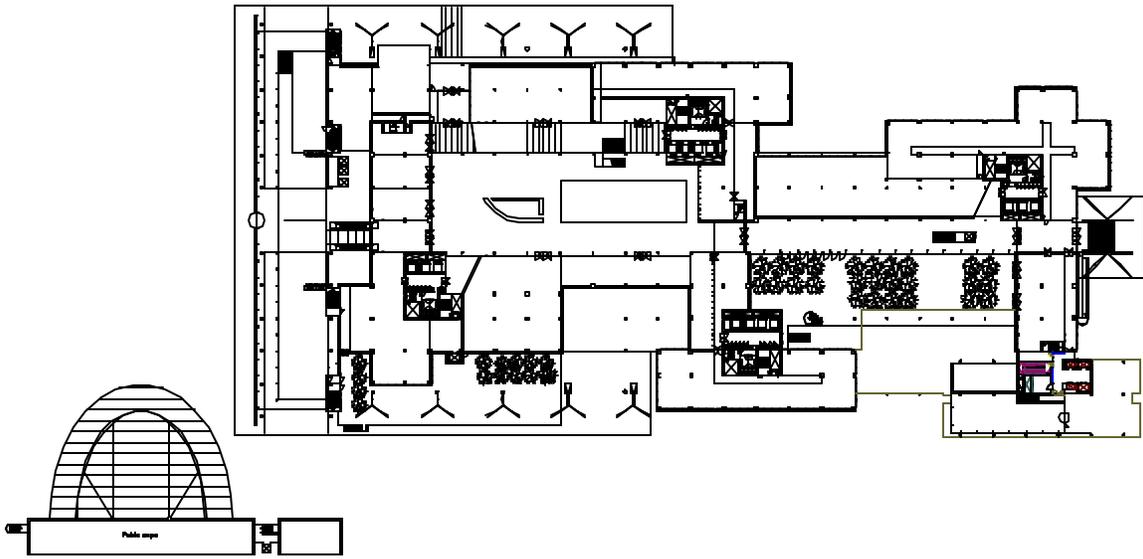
Second Floor Plan of WTC, not to scale (courtesy of KPFI)
